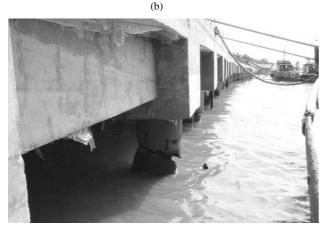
Road widening and riverbank protection using corrugated concrete sheet pile and concrete spun piles.
